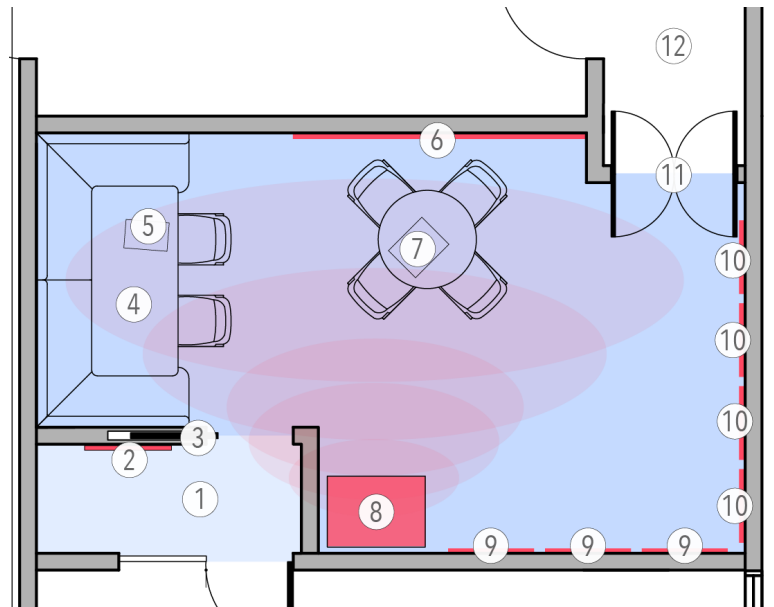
Floor plan for Room #3: Vie's Chicken & Steaks
